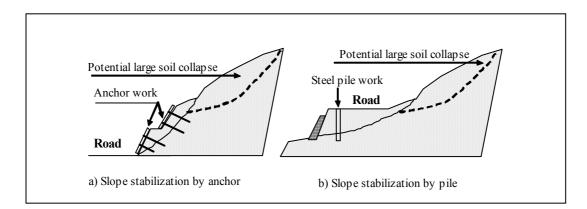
Schematic Diagrams of Anchor and Pile Works
